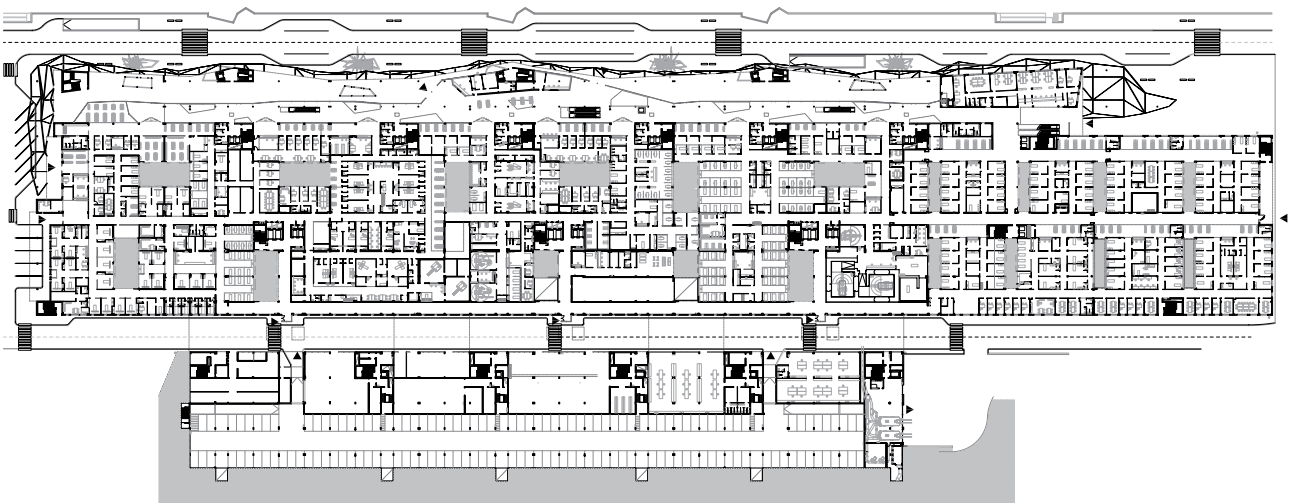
First floor plan. Source: CASA Solo Arquitectos SLP
